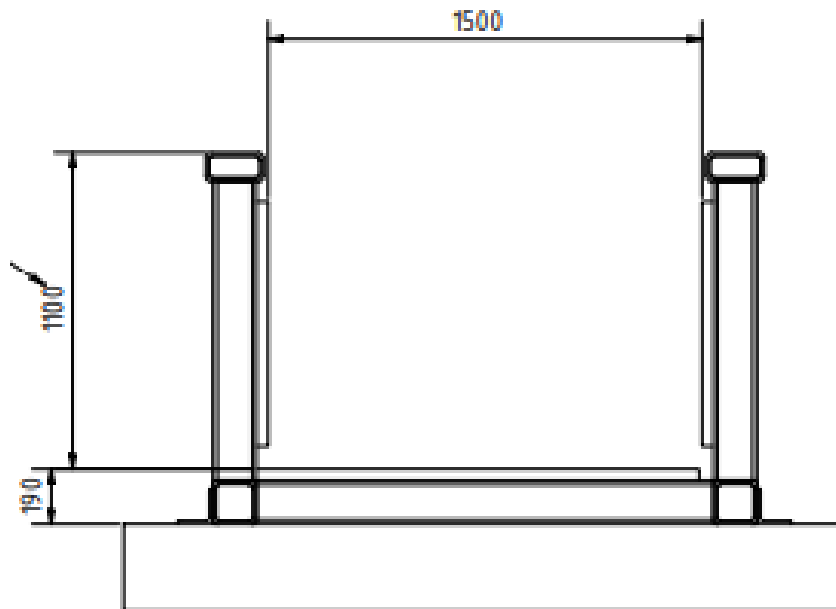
Cross section of the bridge showing both the top and bottom chords.
